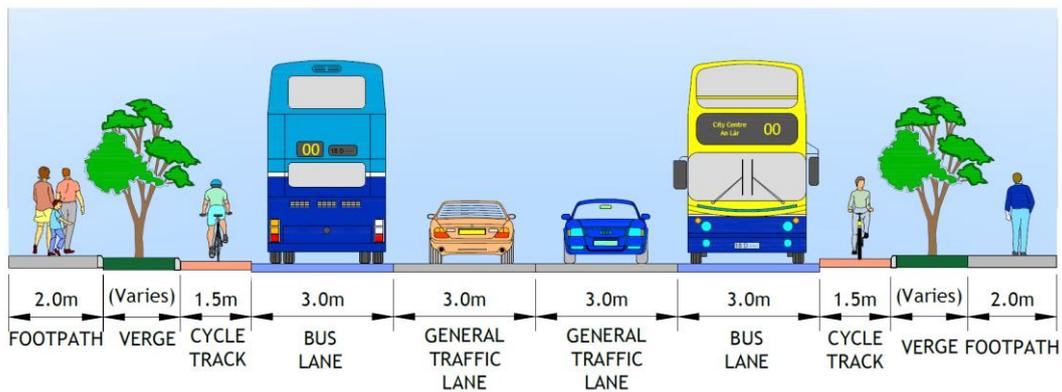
Cross-Section C-C (Relevant to TG2 and TG3)
